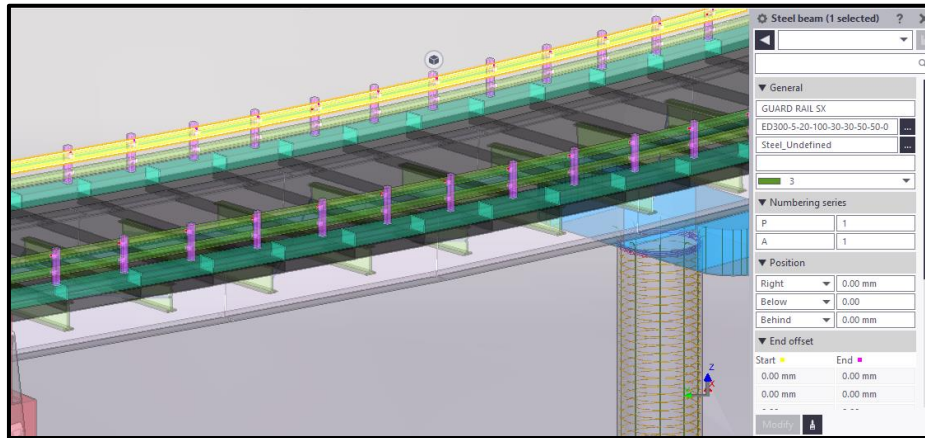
3D view of the Guard rail and Curb in Tekla
